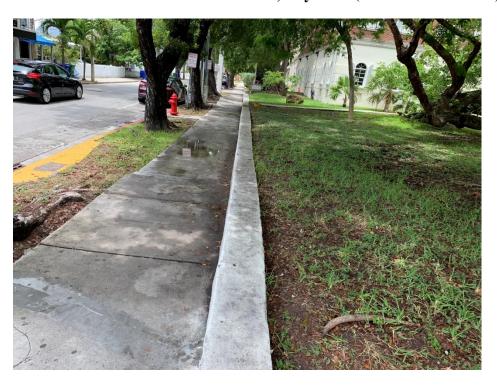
View of the Concrete Retaining Wall of Monroe County-owned Property (530 Whitehead Street) and Sidewalk Along Northwest Side of Southard Street, Key West (AECOM June 2019)
